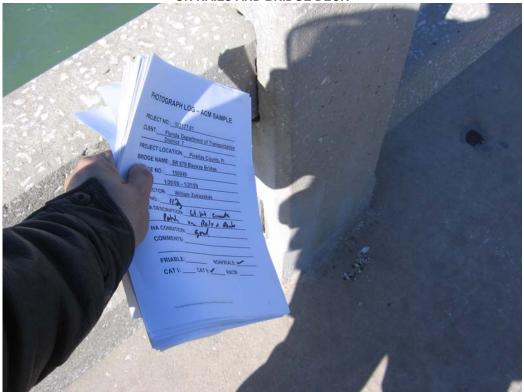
01/21/09 – SAMPLE 11.2 – HA 11 LIGHTWEIGHT CONCRETE PATCHING ON RAILS AND BRIDGE DECK
